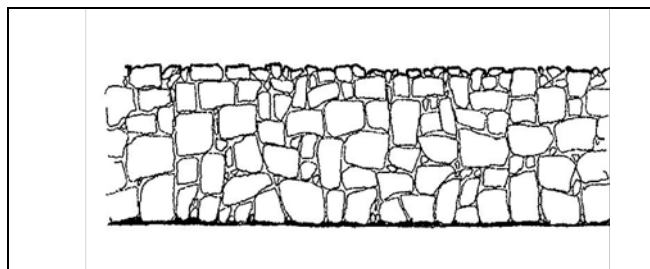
The traditional early stone wall as seen in Residential 1 areas was approximately one metre high. It was commonly constructed as a dry stone wall (without mortar), resulting in a rustic appearance, rather than the more refined appearance of many contemporary stone walls. In the early suburbs where these walls occur, such as Mt Eden, it is preferable to construct walls with a similar appearance to the traditional, even if reinforcing steel and mortar is used. With care, the mortar can be largely concealed on the faces and top edge of the wall. In the suburbs with a predominance of volcanic walls, the District Plan allows such walls to be built to a height of 1.2 metres as a permitted activity.
